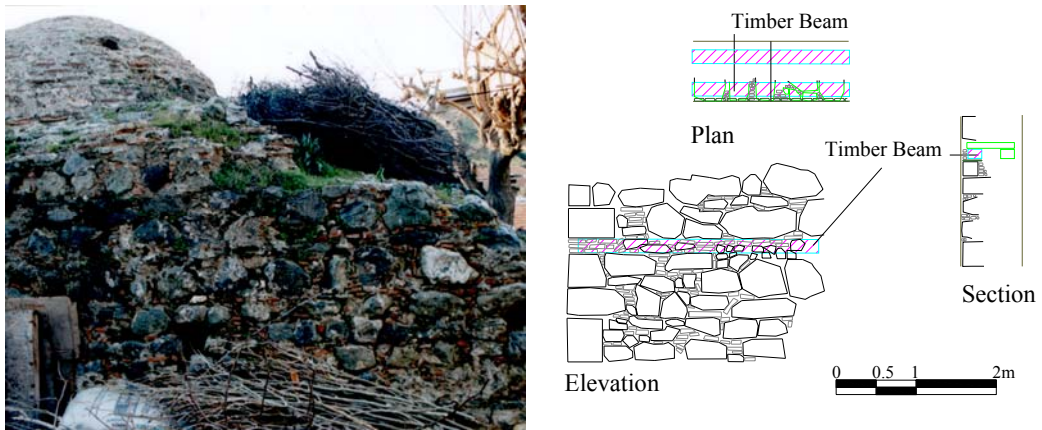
Ulamış Hamamı, East elevation, Rubble stone-large pieces of bricks in joints
